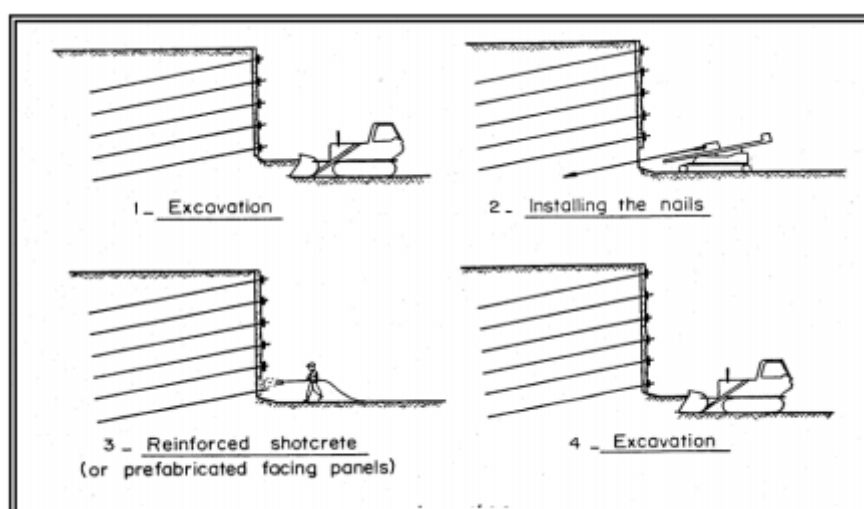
Achievement of a nailed wall with the use of shotcrete
